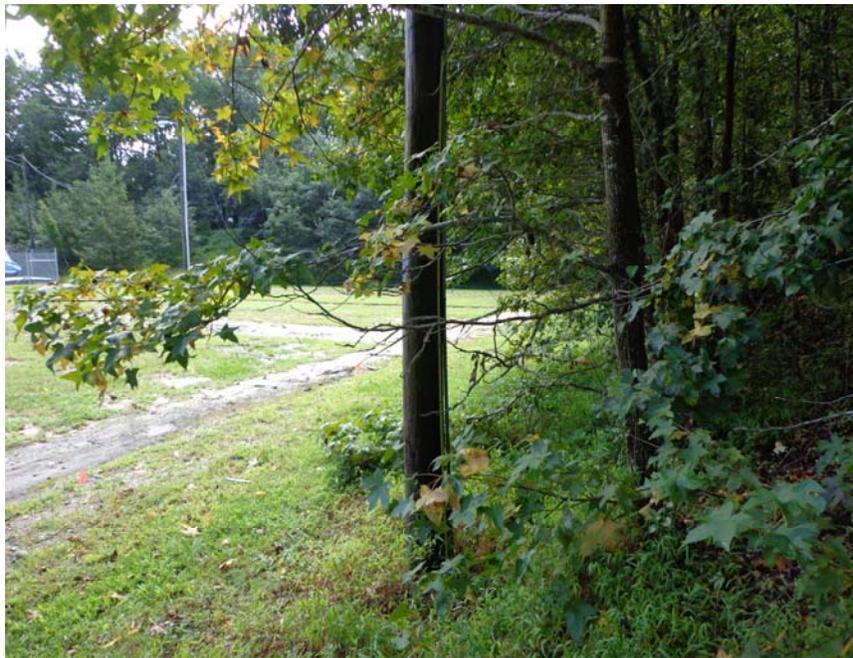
East facing view of the subject property with measuring tape on telephone pole visible, detailing the 10' height of the center side wall berm.
